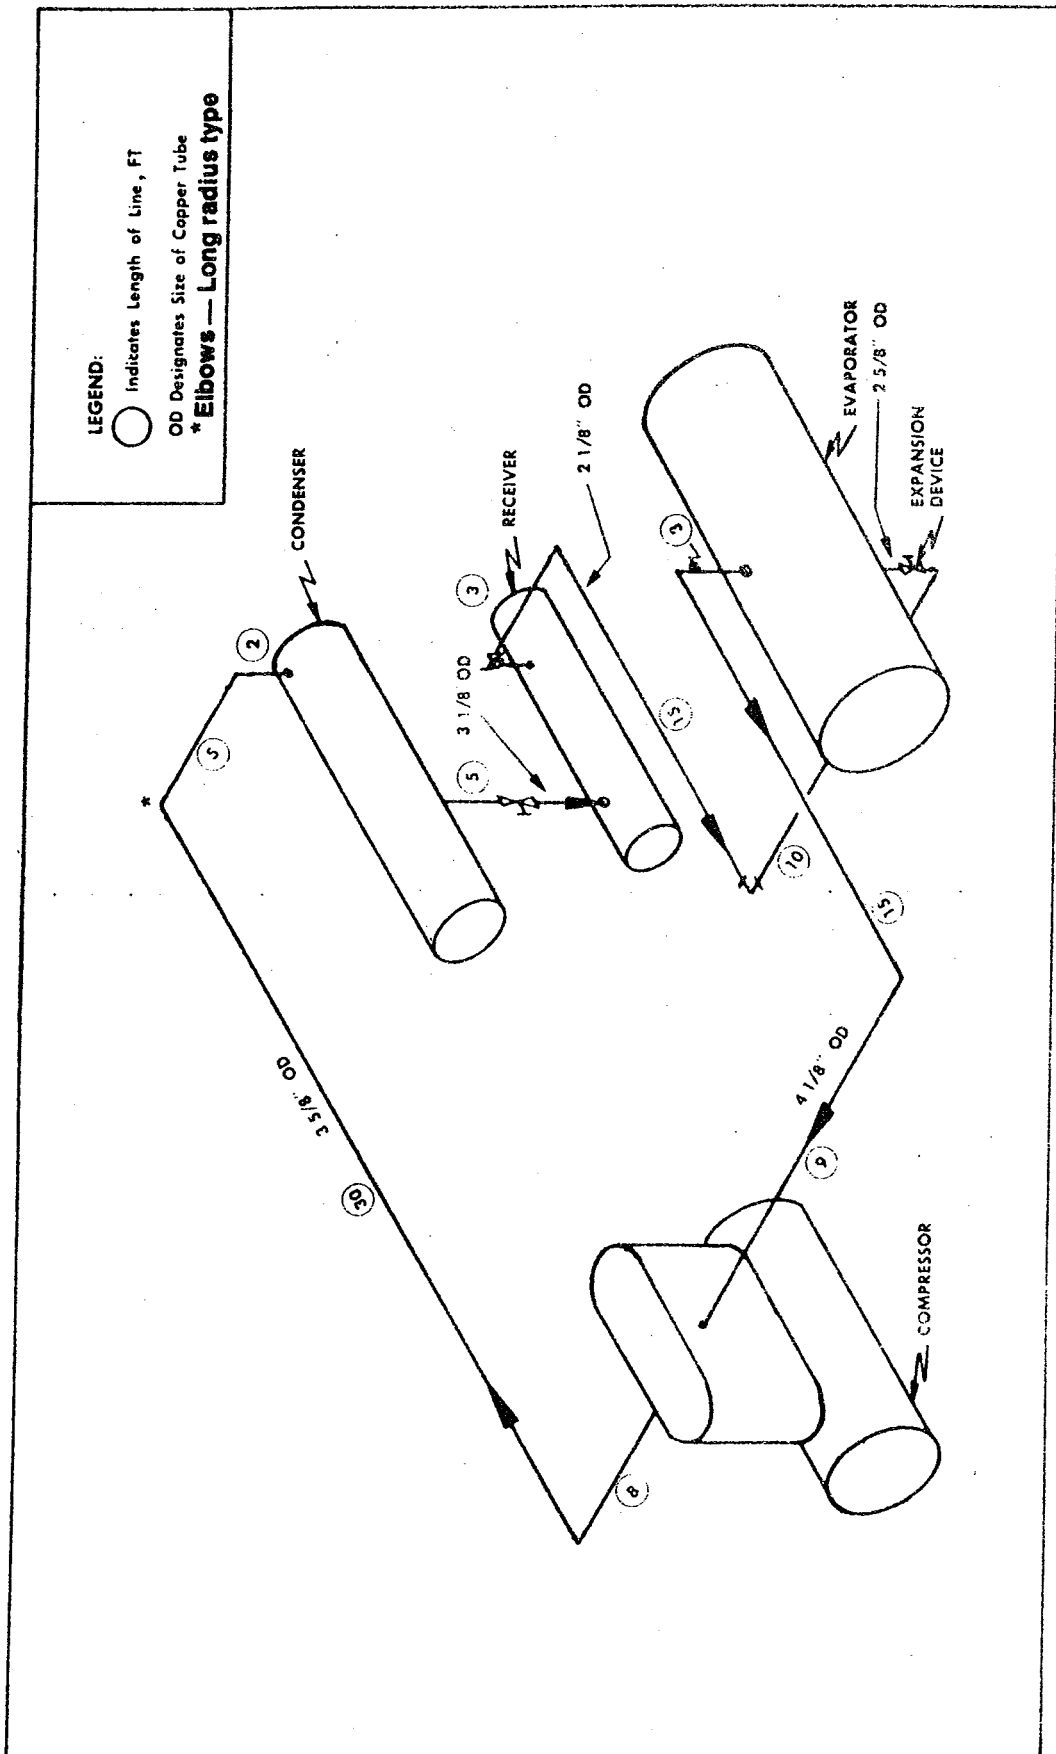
SCHEMATIC PIPING LAYOUT FOR SAMPLE PROBLEM
